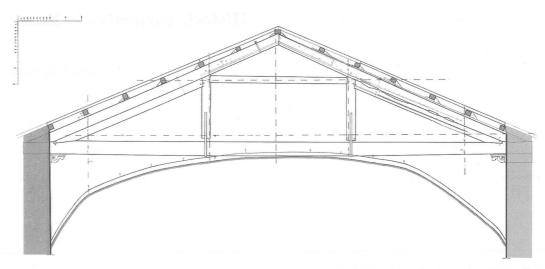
Church of S. Cecilia in Trastevere, Rome. Cross-section of rooftruss (nave) with traces of decorated planks. Survey-drawing, original scale 1:20 (Simona Valeriani)
